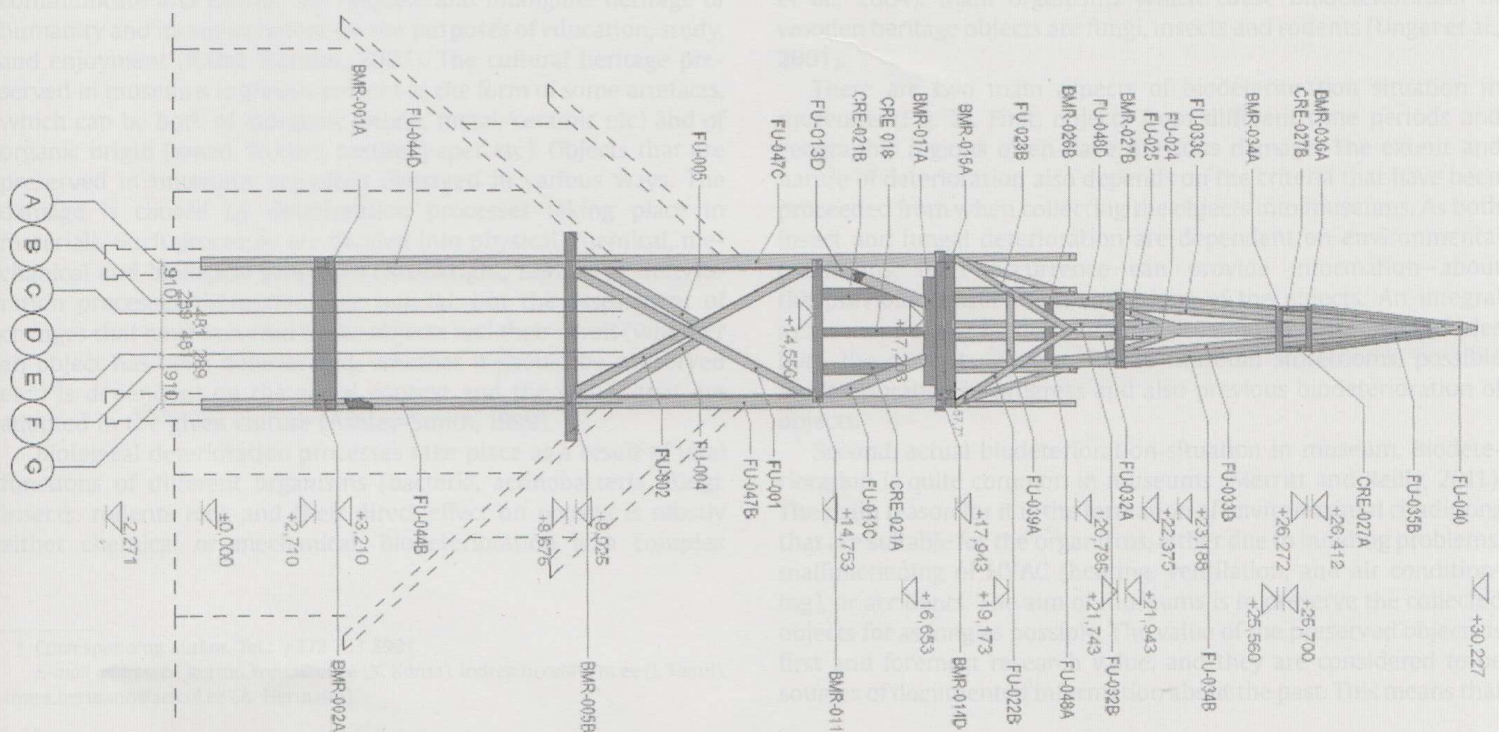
View from east to the steeple structure of the New Maarja Magdaleena church (location of the FU-048D).
